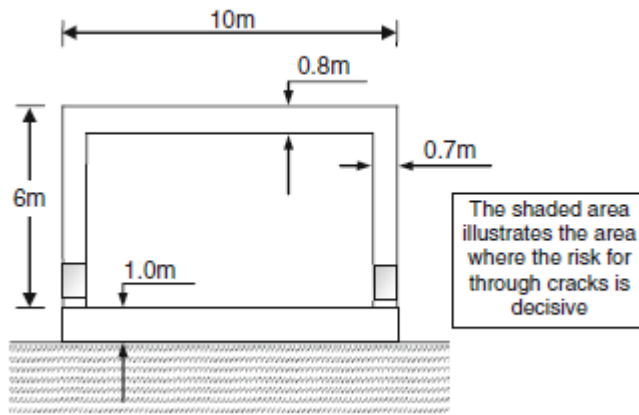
Critical Section of a tunnel for through cracks (Utsi & Jonasson 2012)
